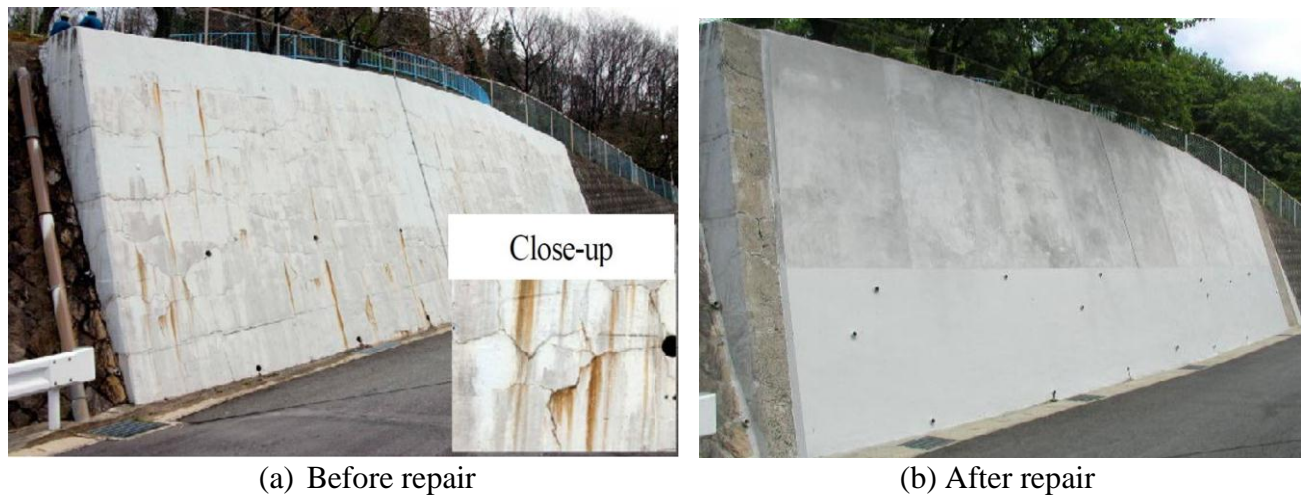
Surface repair of concrete retaining wall (Rokugo et al., 2005)
